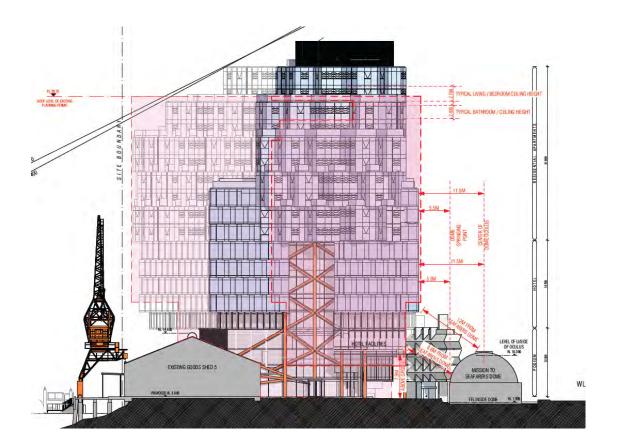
elevation indicating some of the changes from the approved to the proposed building envelope
